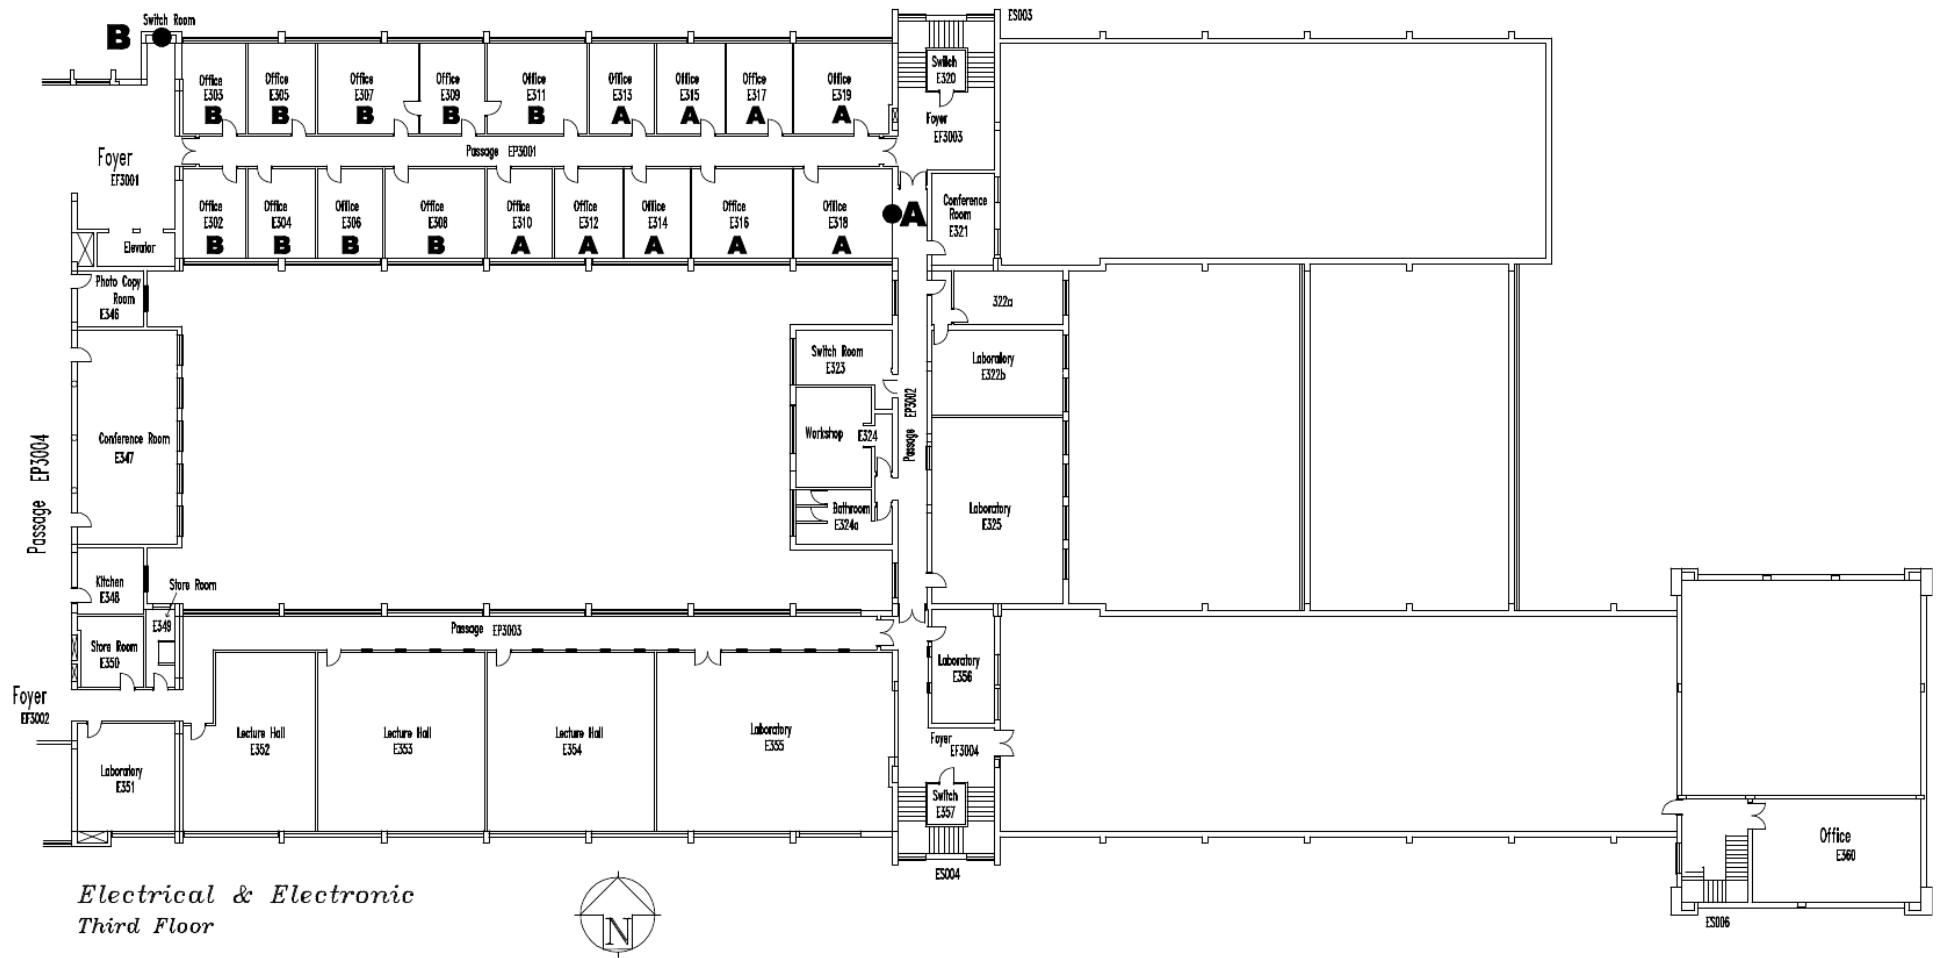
Floor plan for the third floor of the Electrical and Electronic Engineering Faculty.
